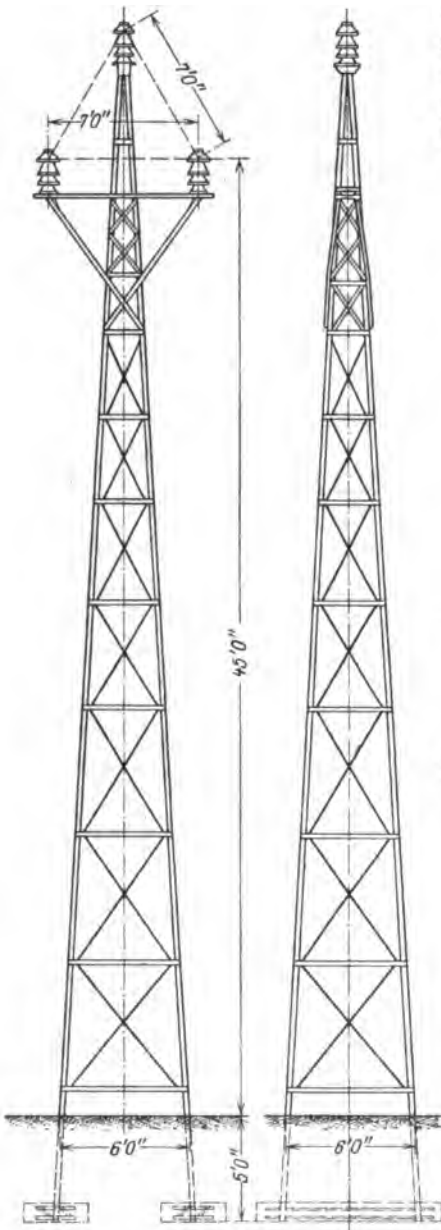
Detail of 45-Foot Angle Iron Tower at Syracuse, N. Y.
